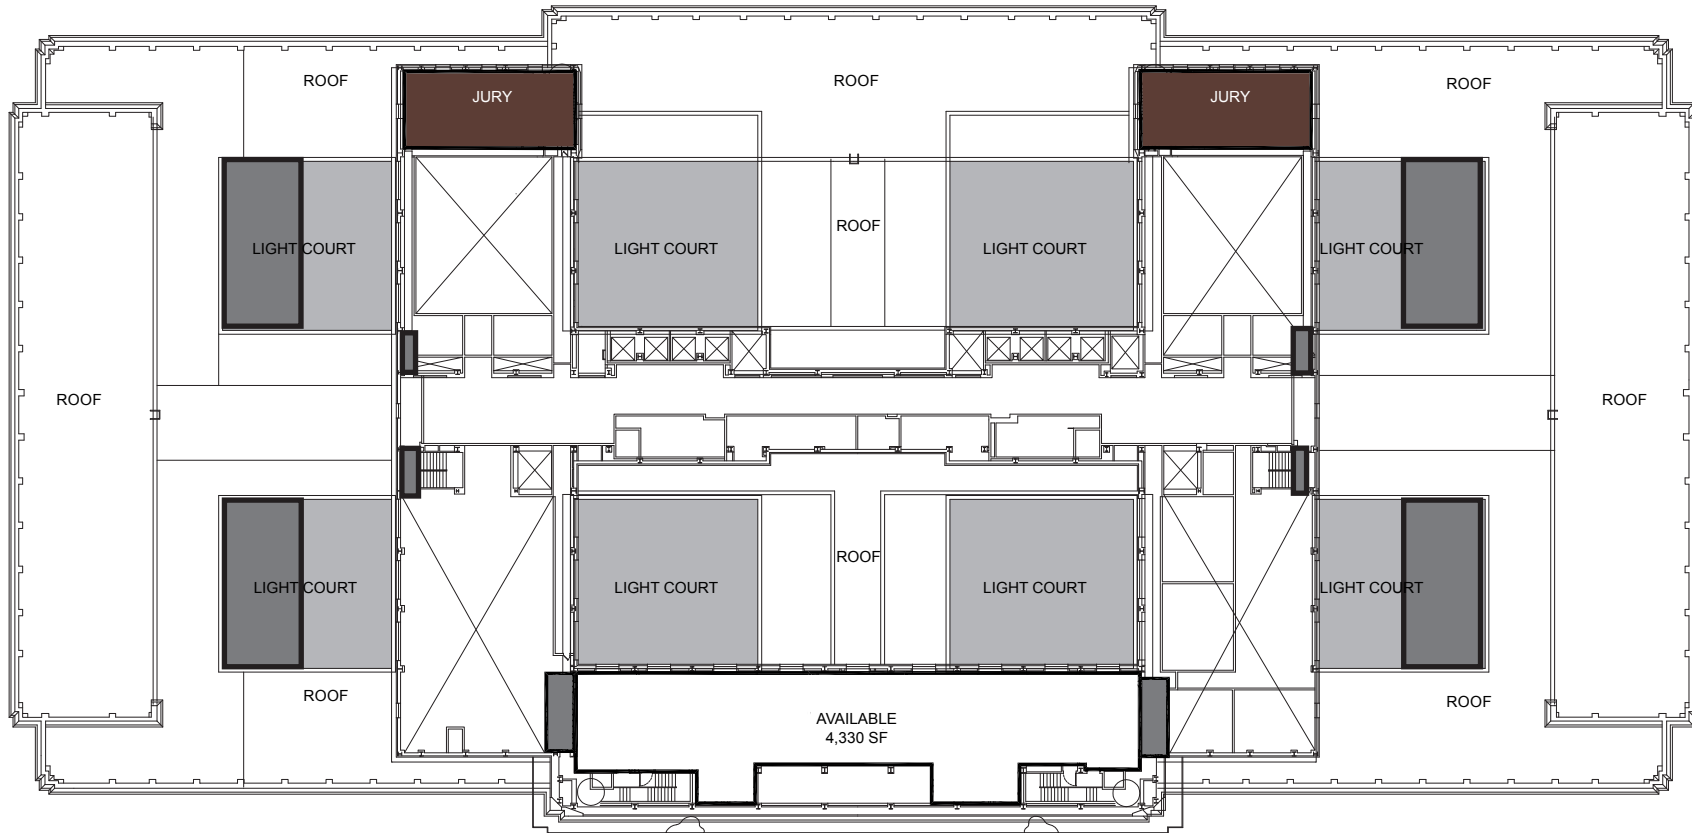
Seventh Floor Plan - Historic Courthouse - Scenario 3
